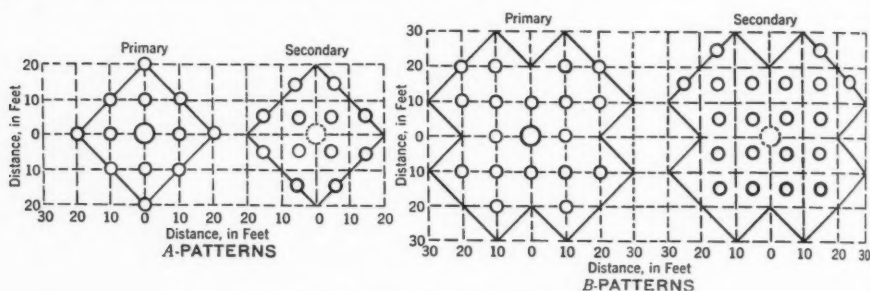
TYPICAL PATTERN LAYOUT AND DRILLING DIAGRAM
